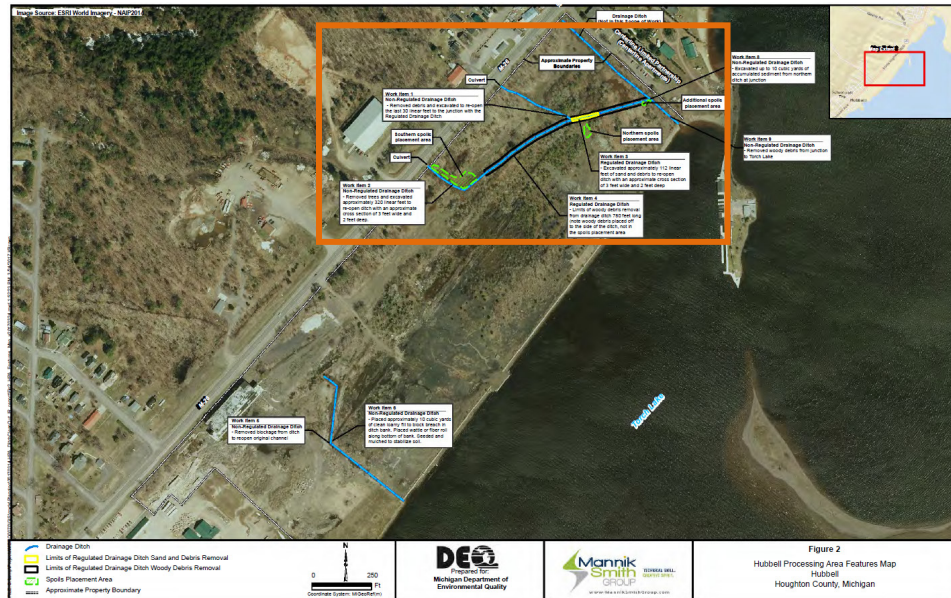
MSG Coal Dock Ditch Clean Out Site Plan [18]. Modified by author.
